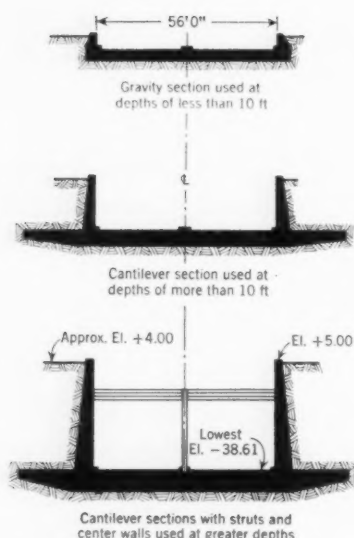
Reinforced-concrete trough sections for approaches give stability against worst possible loading and against uplift.
